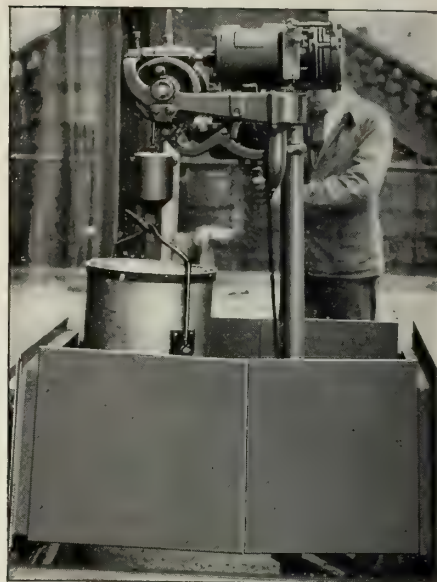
MODEL E HOIST WITH COMPLETE EQUIPMENT AS INSTALLED AT JAY THORPE BUILDING, 57TH STREET NEAR FIFTH AVENUE, NEW YORK
